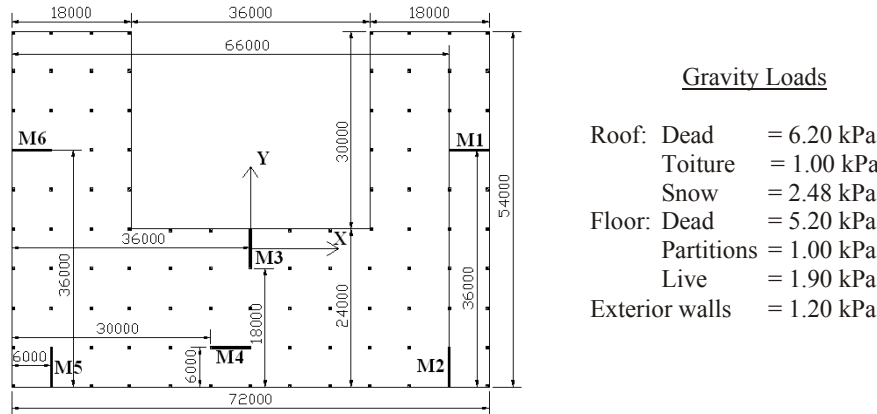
Layout of a typical floor (dimensions in mm) and design gravity loads
